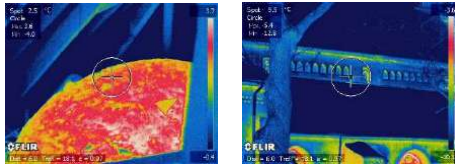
Ceiling vault in the attic Figure 9. Attic from the outside
